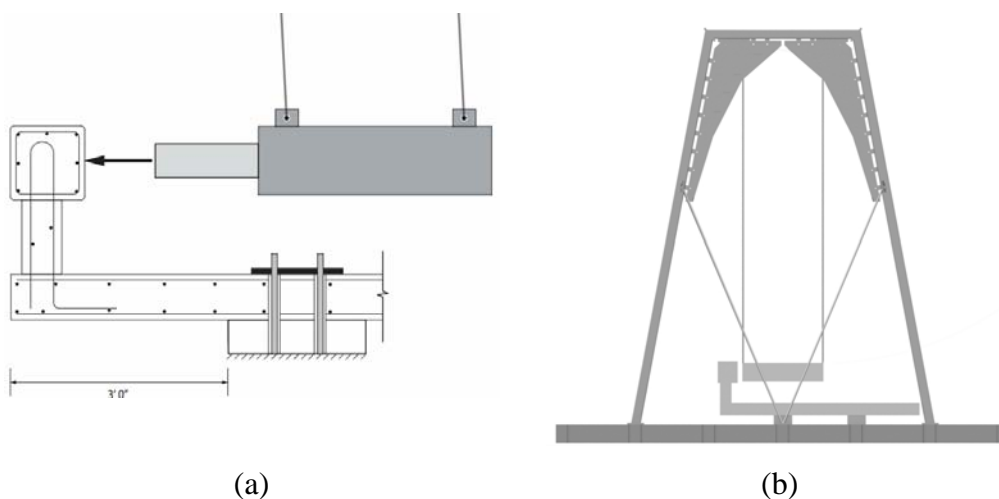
(a)- T203 bridge deck and barrier test specimen with pendulum mass and (b) their position within pendulum support frame
